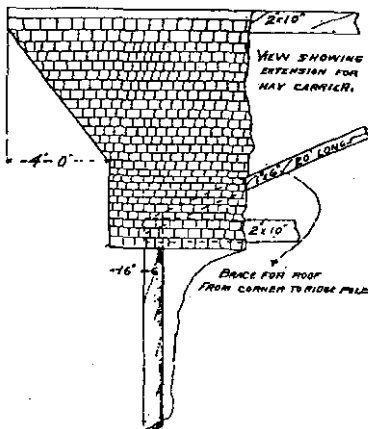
Section of roof of hay barn, showing extension for hay carrier track and plan for bracing roof.
